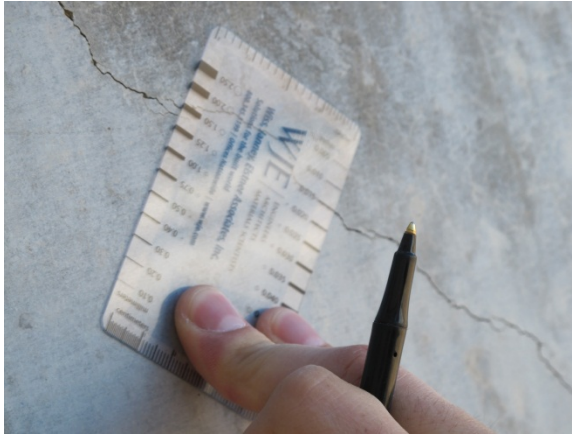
Largest shear crack (0.015 inches) (b in Figure A-74)
